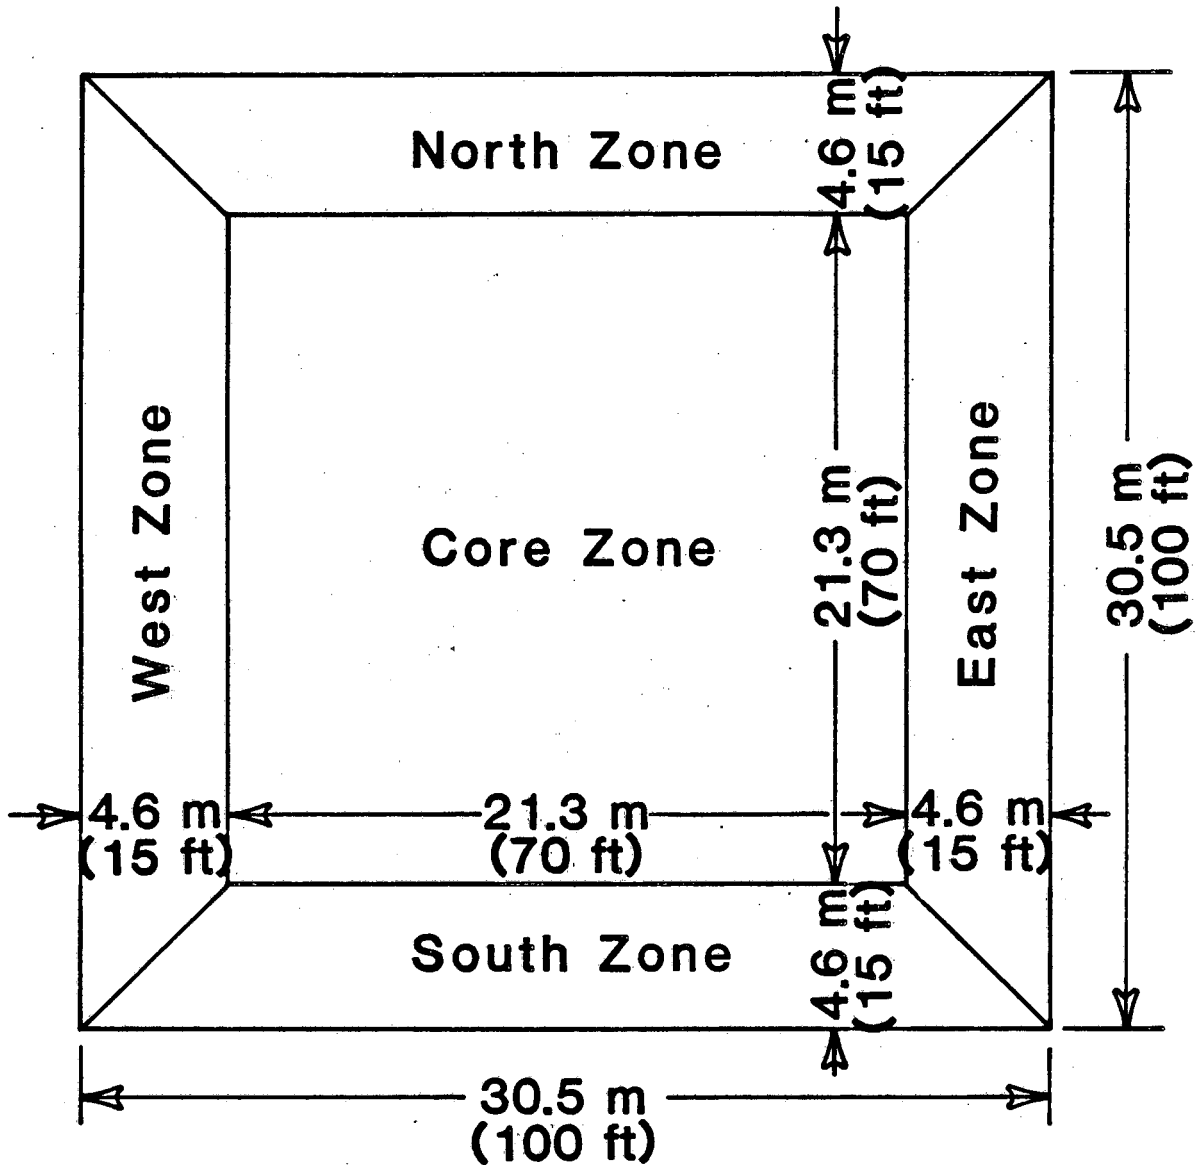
SCHEMATIC FLOOR PLAN OF PROTOTYPE COMMERCIAL BUILDING
